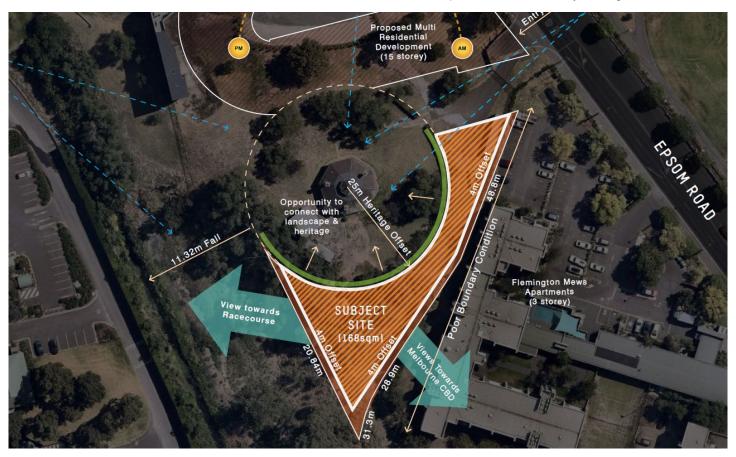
Extract from the Urban Context Report conceptually outlining the applicant's rationale for their building layout
